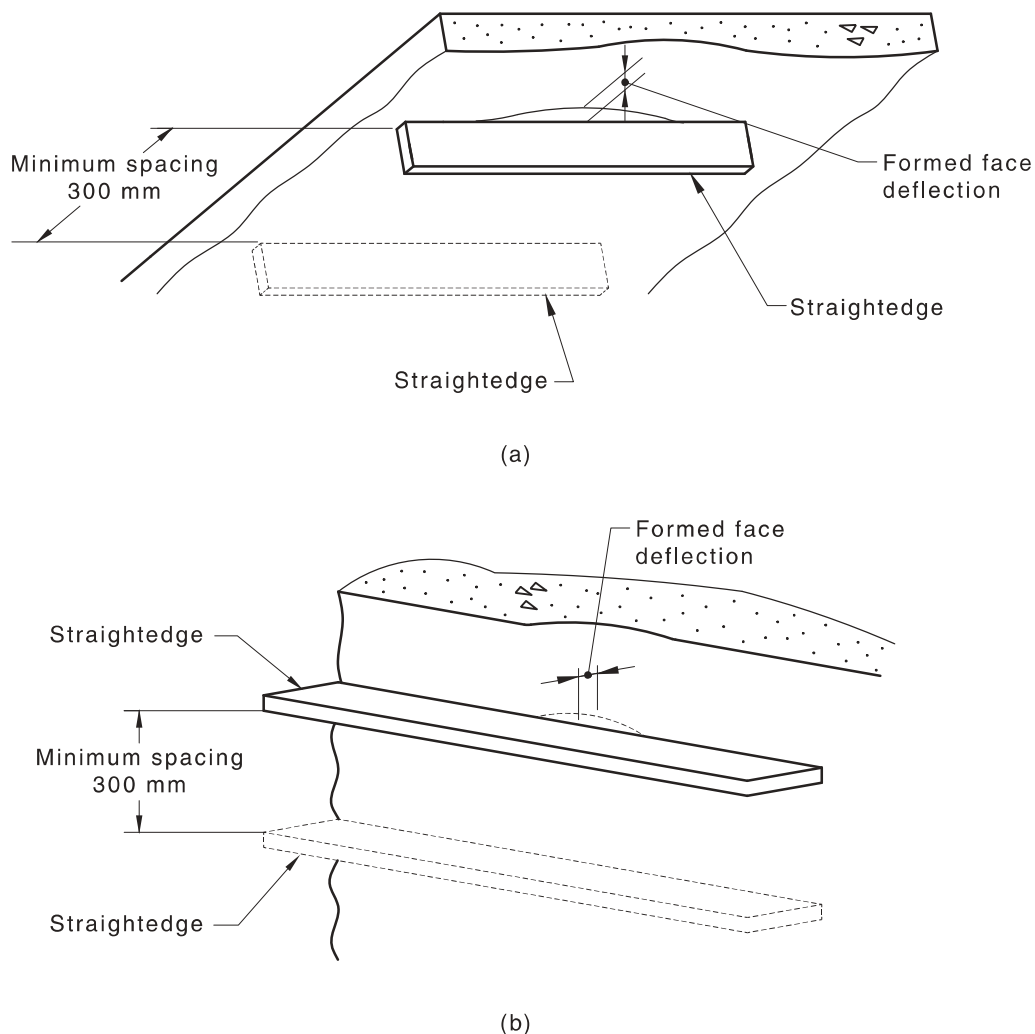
MEASUREMENT OF FORMED FACE DEFLECTION
